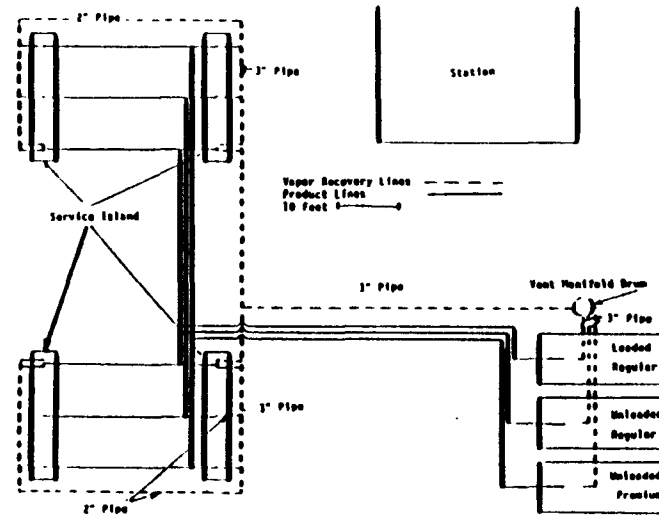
Stage II Underground Piping Layouts for Model Plant 4
